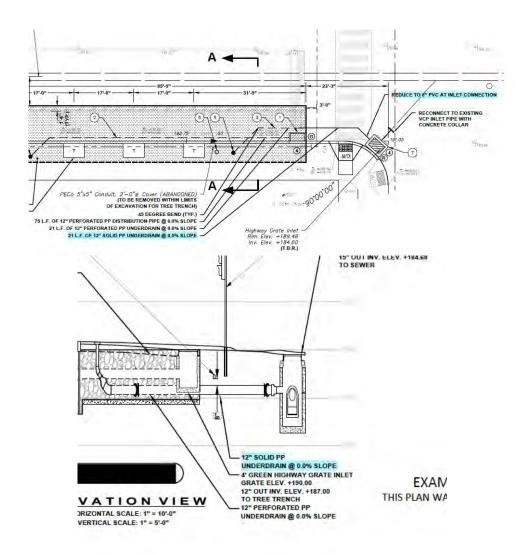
The recommended pipe for scenario 10.b.ii above, where the underdrain connection from a lined stormwater trench to the gray inlet is over 20 feet.
